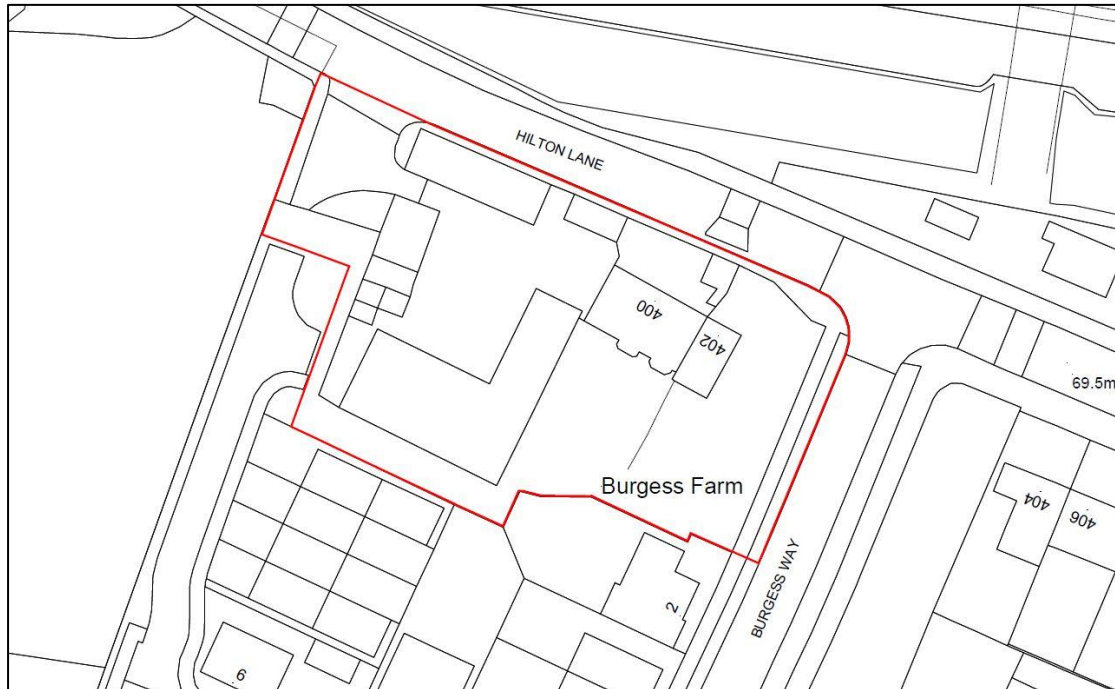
Site Plan showing former farm buildings (Courtesy of client)
